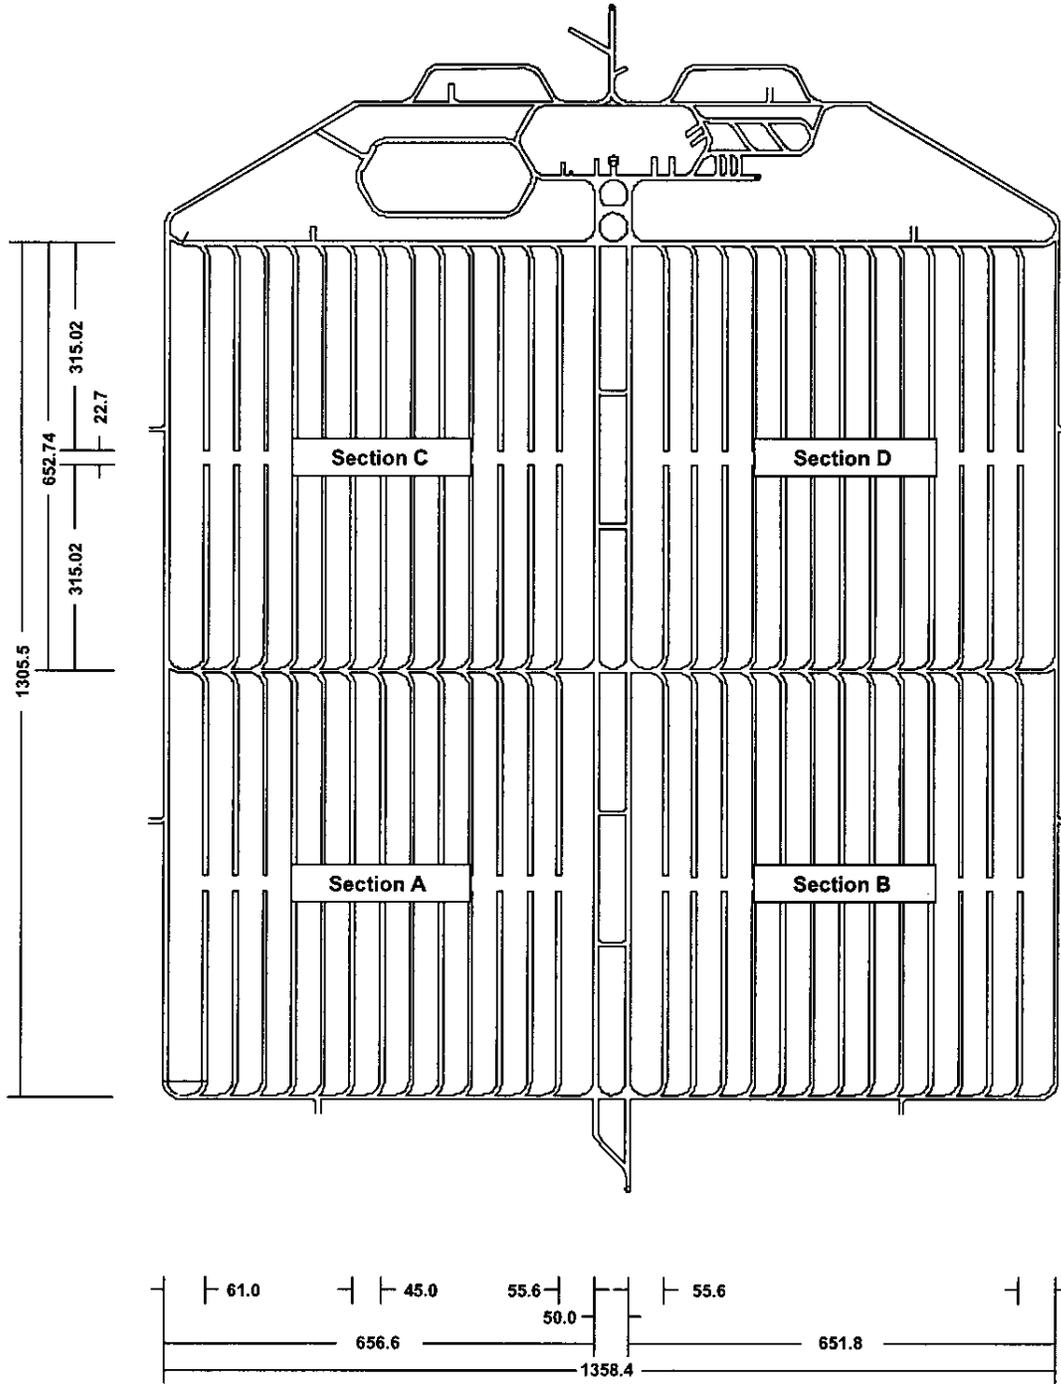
Example repository layout for the in-room emplacement design showing the emplacement rooms, access tunnels and general facility support areas. All dimensions are in m. This illustrated vault holds about 11,000 reference containers and was used in the Third Case Study (Gierszewski et al. 2004a).
